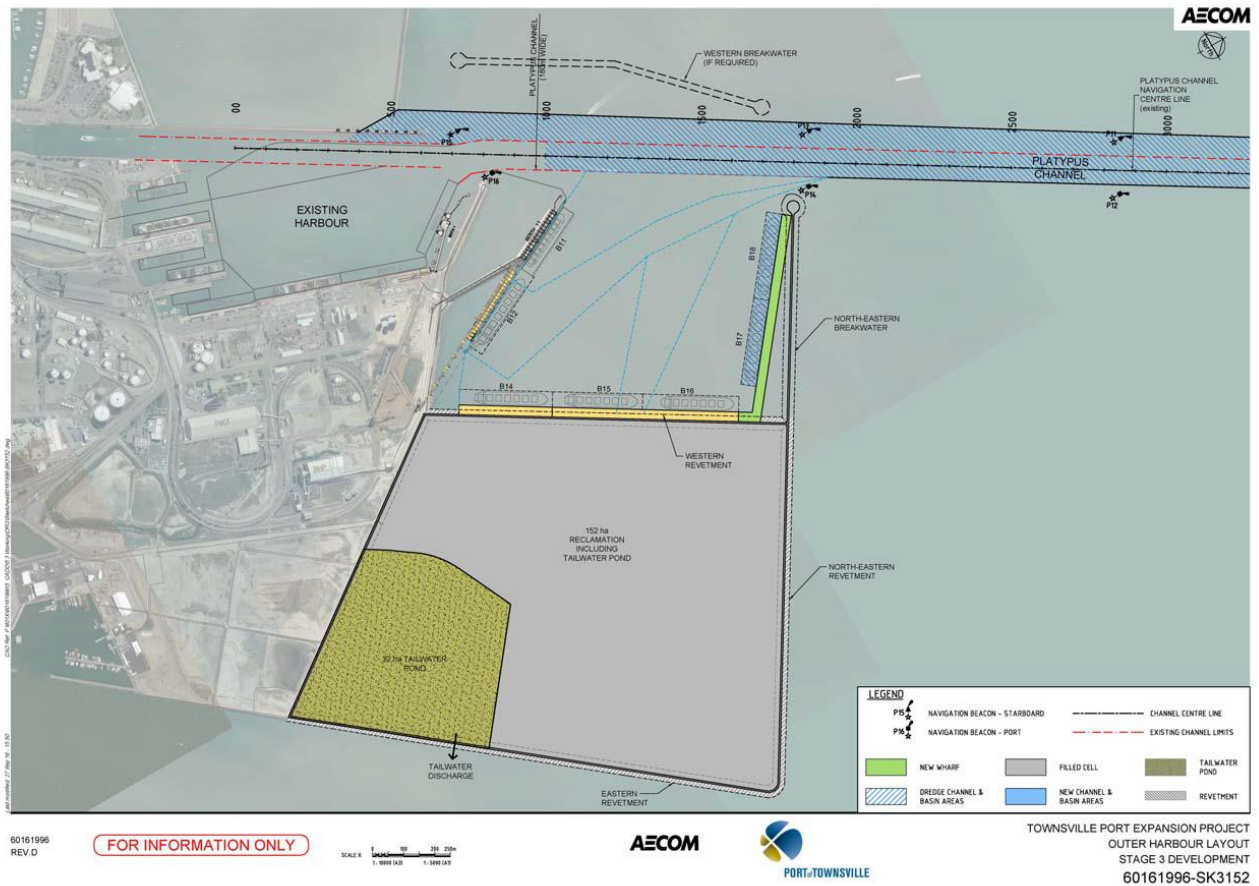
Port Expansion Plan AEIS Stage 3 Layout
